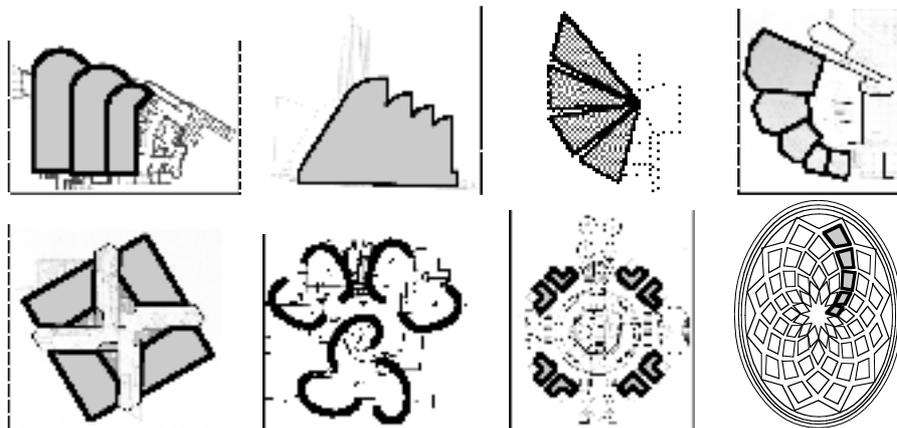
Patterns from shapes in floor plans of buildings and spaces.
